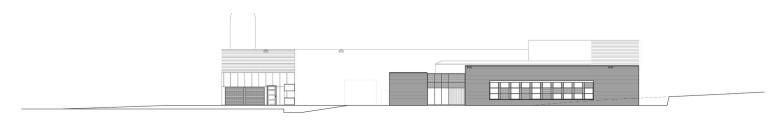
BUILDING Y - WORK UNIT - EAST ELEVATION
